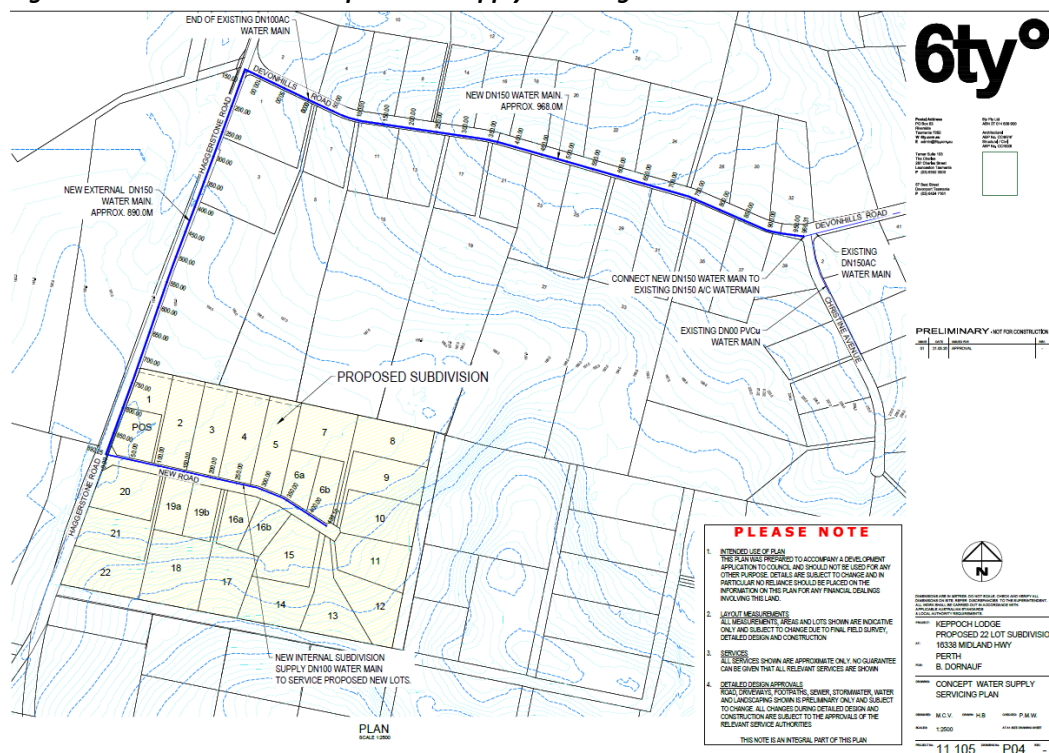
PLN-18-0216 - Proposed plan (refused by Council)
